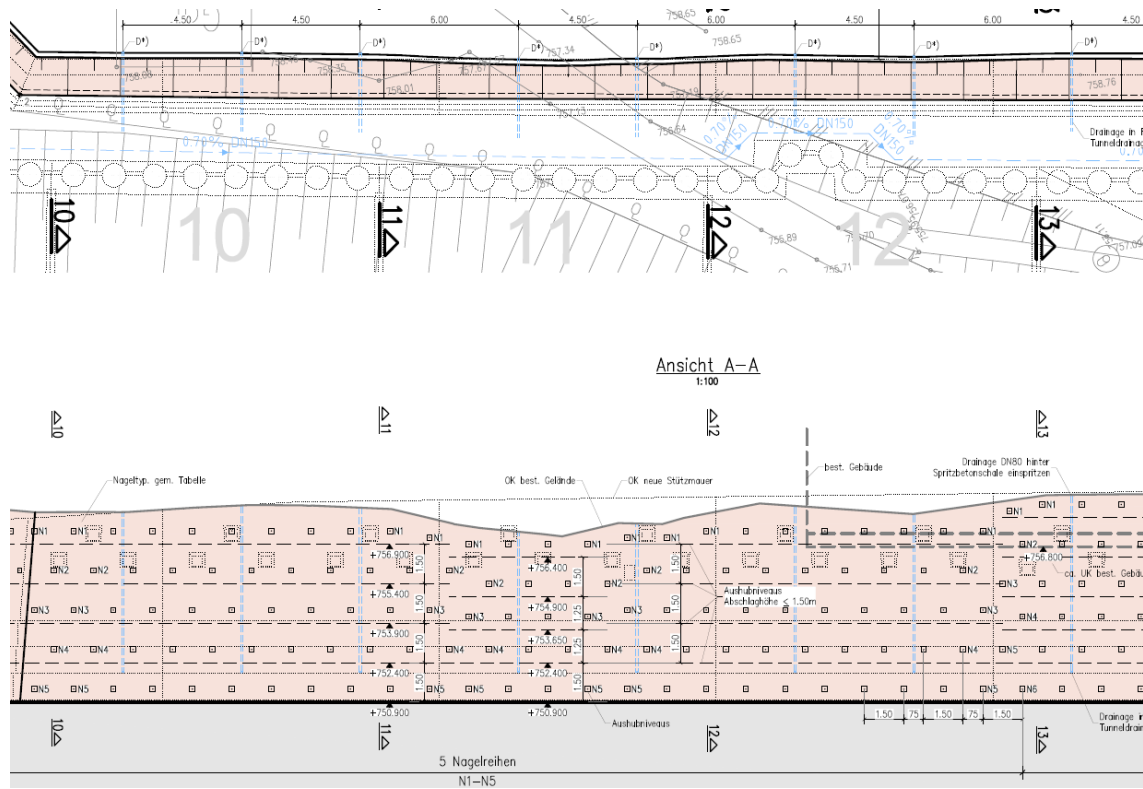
Plan view and front view of the Unzmarkt soil nail wall
